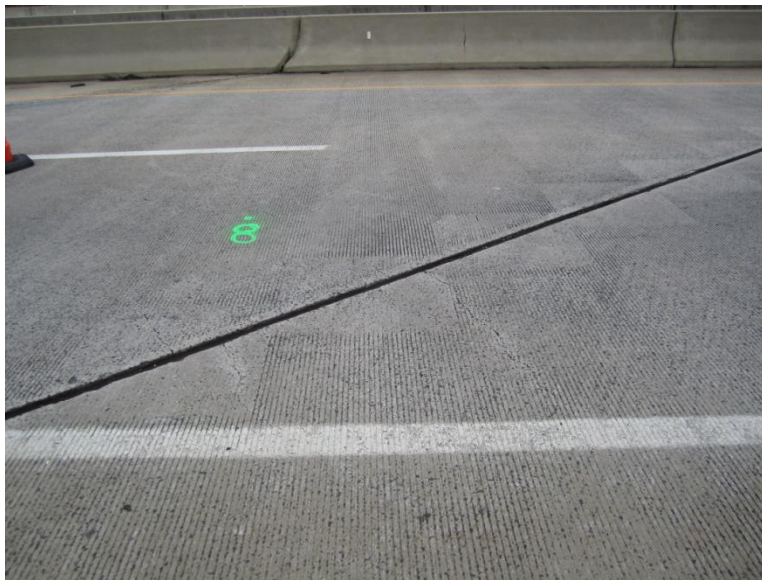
Cracks extending perpendicular to expansion joint on bridge deck 9L.
